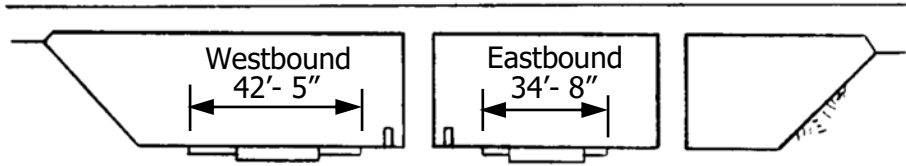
Bridge elevation view of two separate highway features below the bridge.
